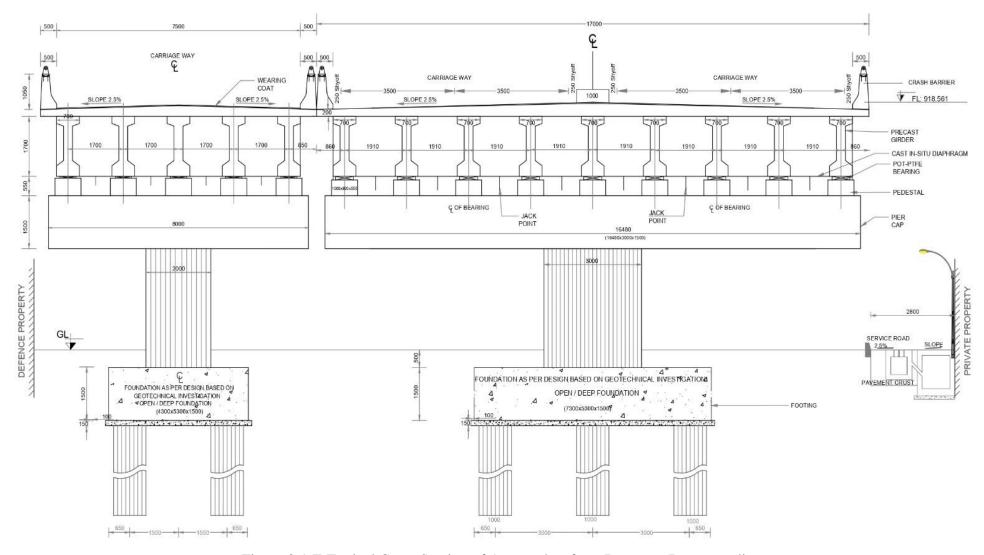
E Typical Cross Section of Approaches from Rotary to Banasawadi
